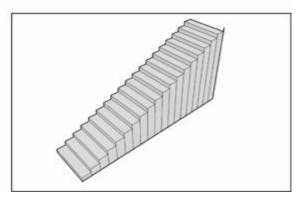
The Subdivided Rectangles method of building stairs.
